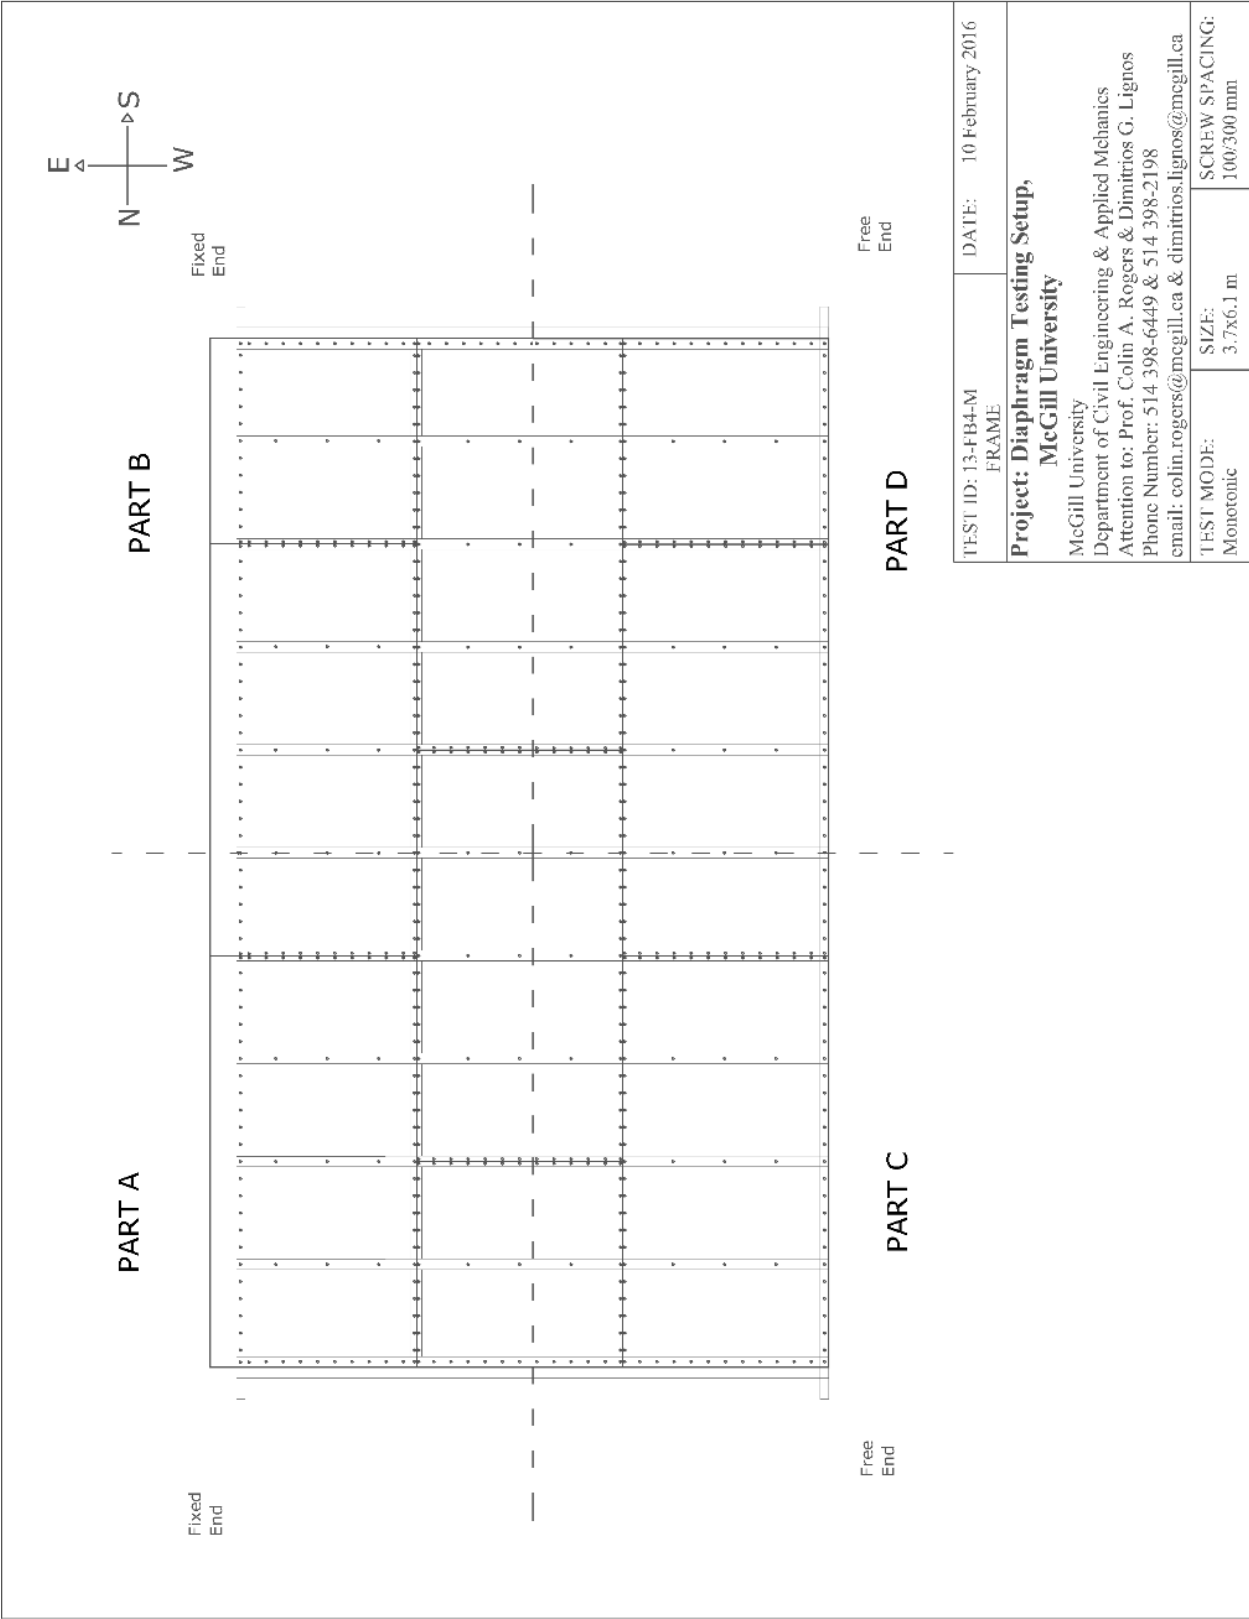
Sheathing Fastener Placement for Specimen 13-FB4-M
